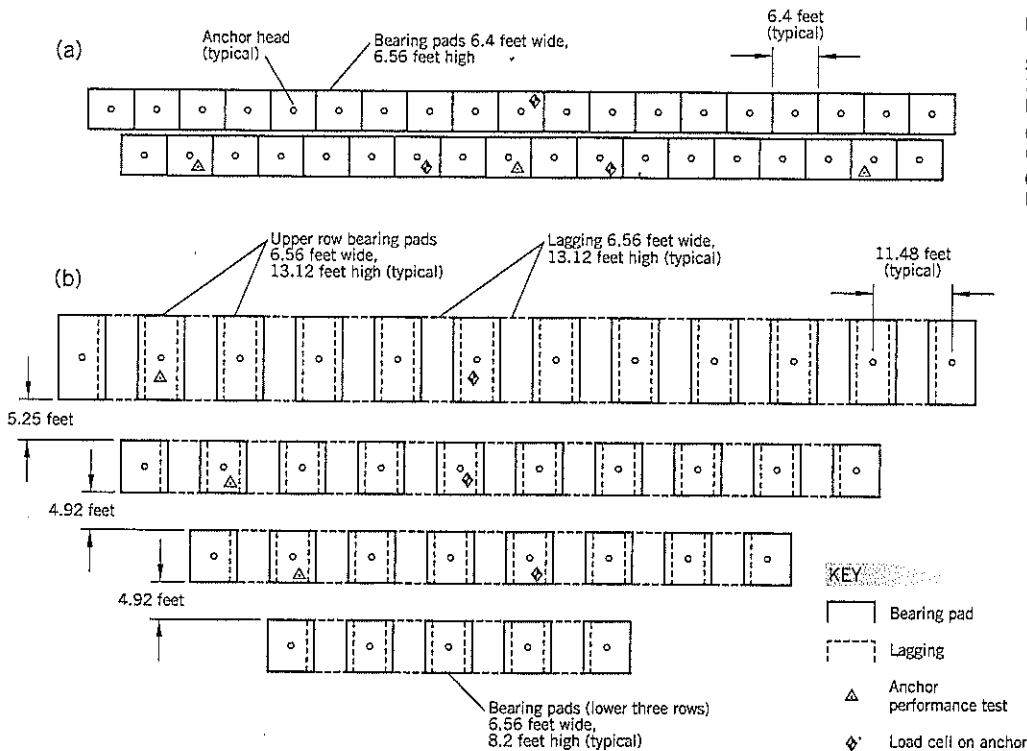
Richardson Highway Slide remediation. Elevation of anchor block walls: (a) upper wall (b) lower wall (Ground Support, Redmond, Washington)
